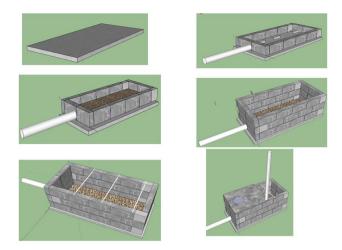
Sketches taken from training guide for on-site fabrication of a GMF digester.
